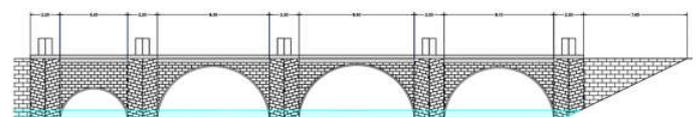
Ponte Oliveira Bridge elevation plan (graphic by the author).
